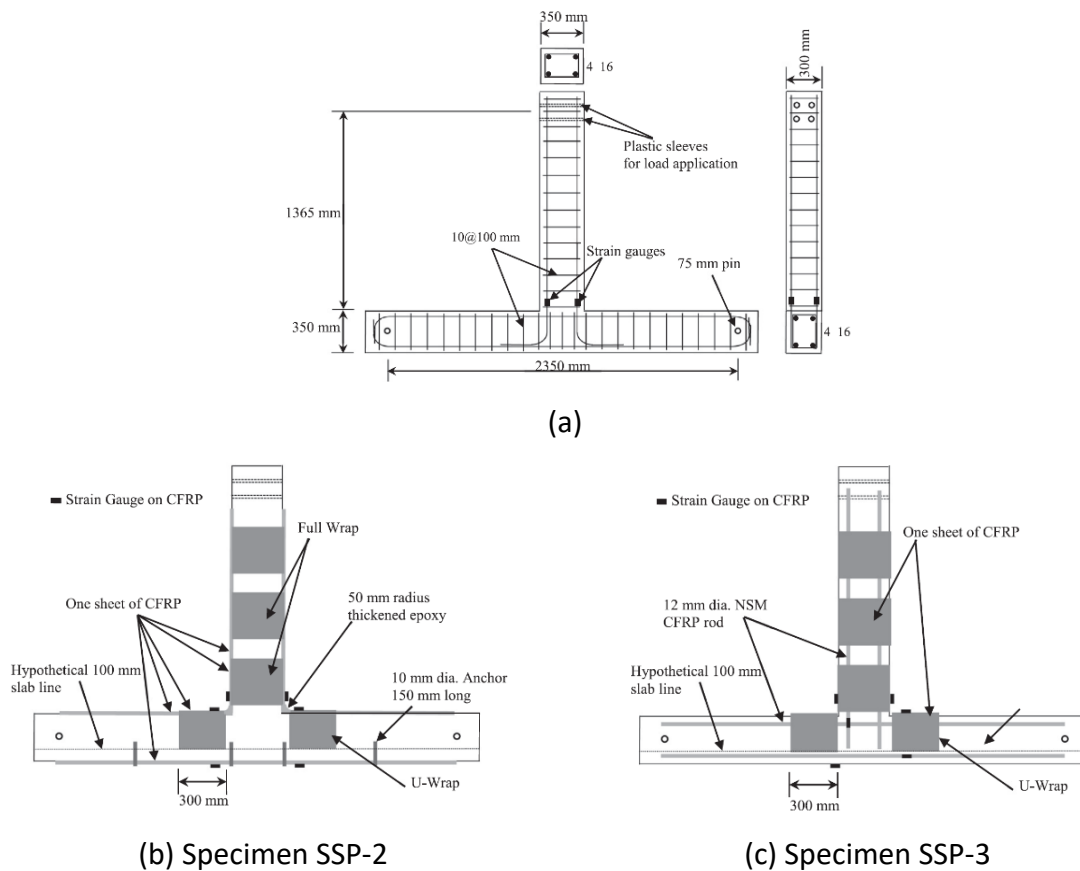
(a) Reinforcement details for each of the three specimens; Details of retrofitting: (b) Specimen SSP-2; (c) Specimen SSP-3 (Saqan et al., 2018).
